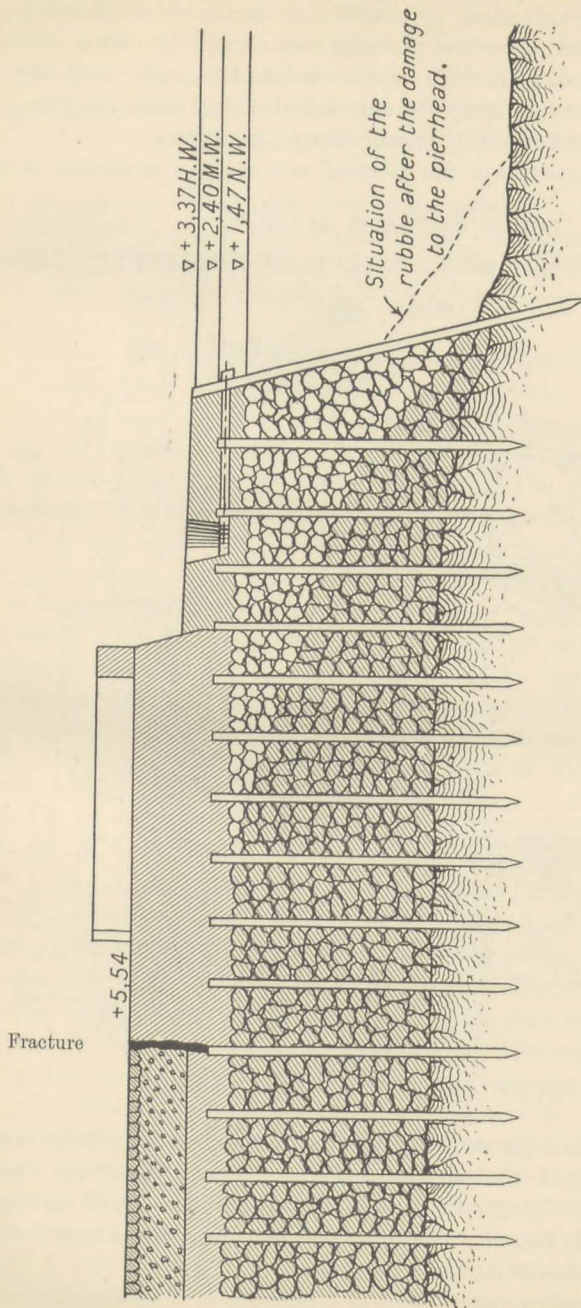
Longitudinal Section of South Pierhead at Pillau.
